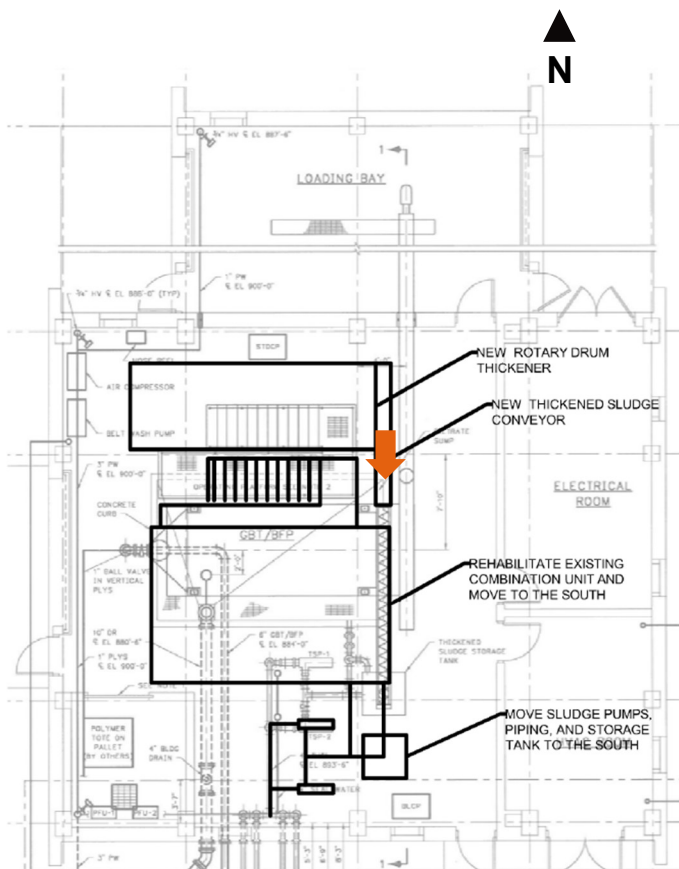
Layout of New Rotary Drum Thickener and Existing Unit
